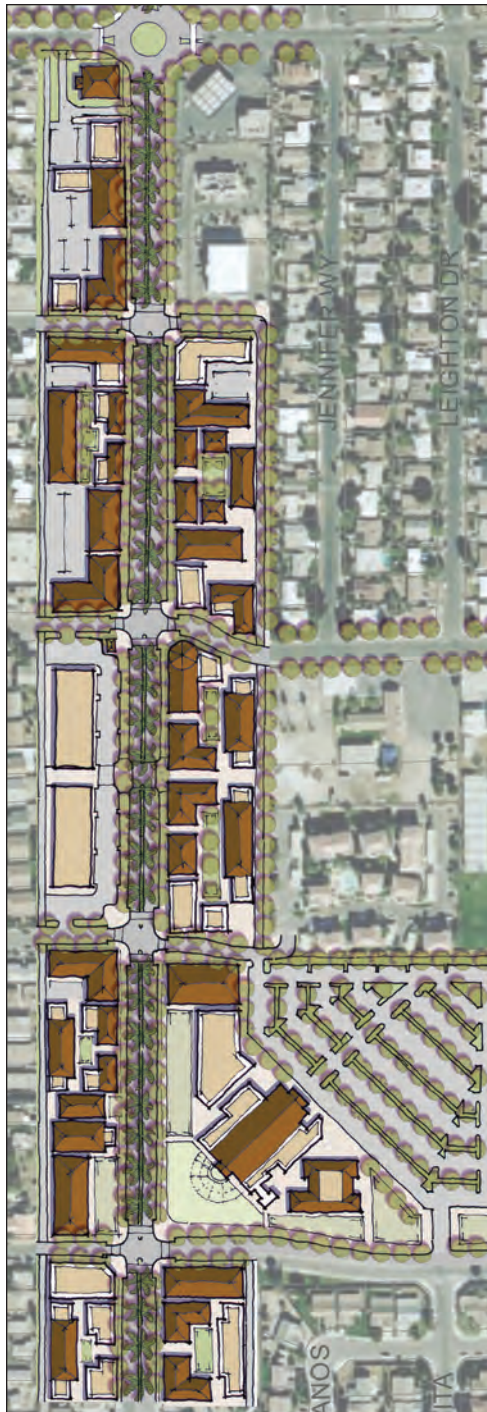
Roundabout design layout for Harrison Avenue and Avenue 52.
